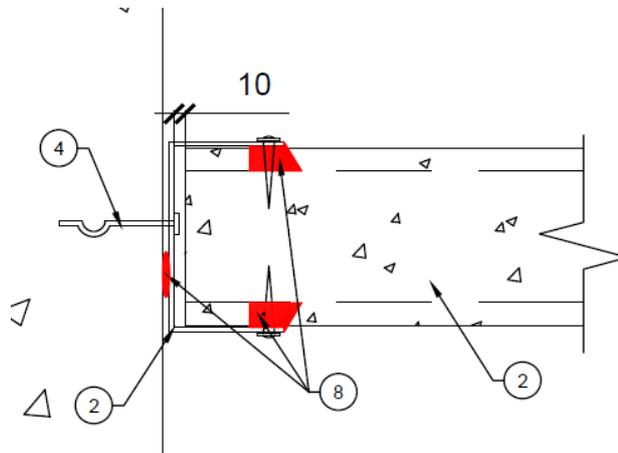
Side Detail for Horizontal Speedpanel Wall
